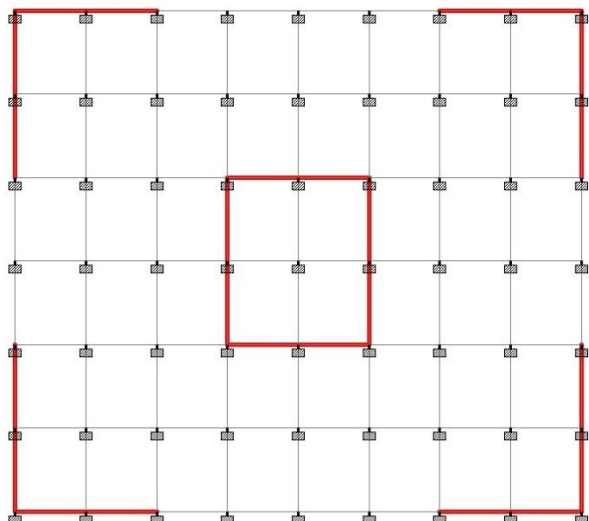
Location of Struts (Double Cross-Strut) in Plan.
